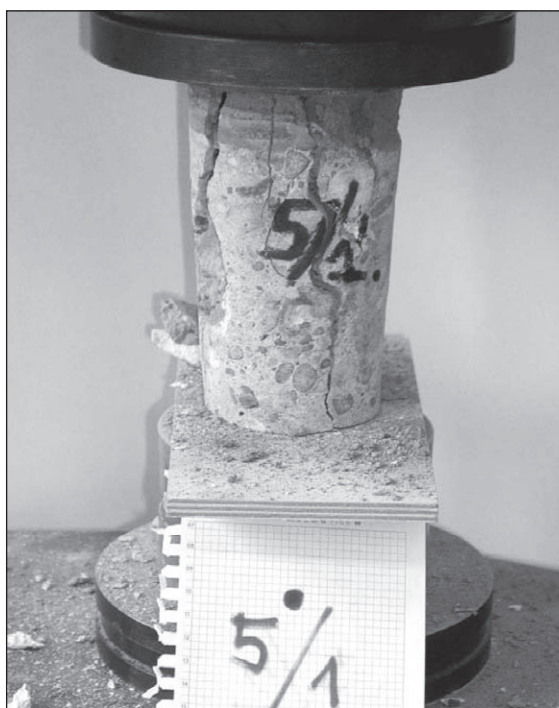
Uniaxial compression test of a concrete cylinder specimen
